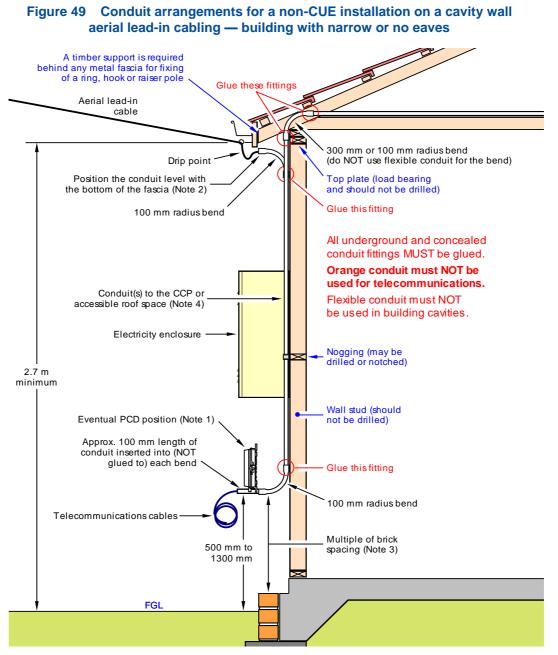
and Figure 49 illustrate typical conduit arrangements for cavity wall (e.g. brick veneer and timber/metal-framed) buildings. For buildings of solid masonry or double-brick construction, refer to Figure 41 (page 48) for typical tie cabling conduit arrangements.
